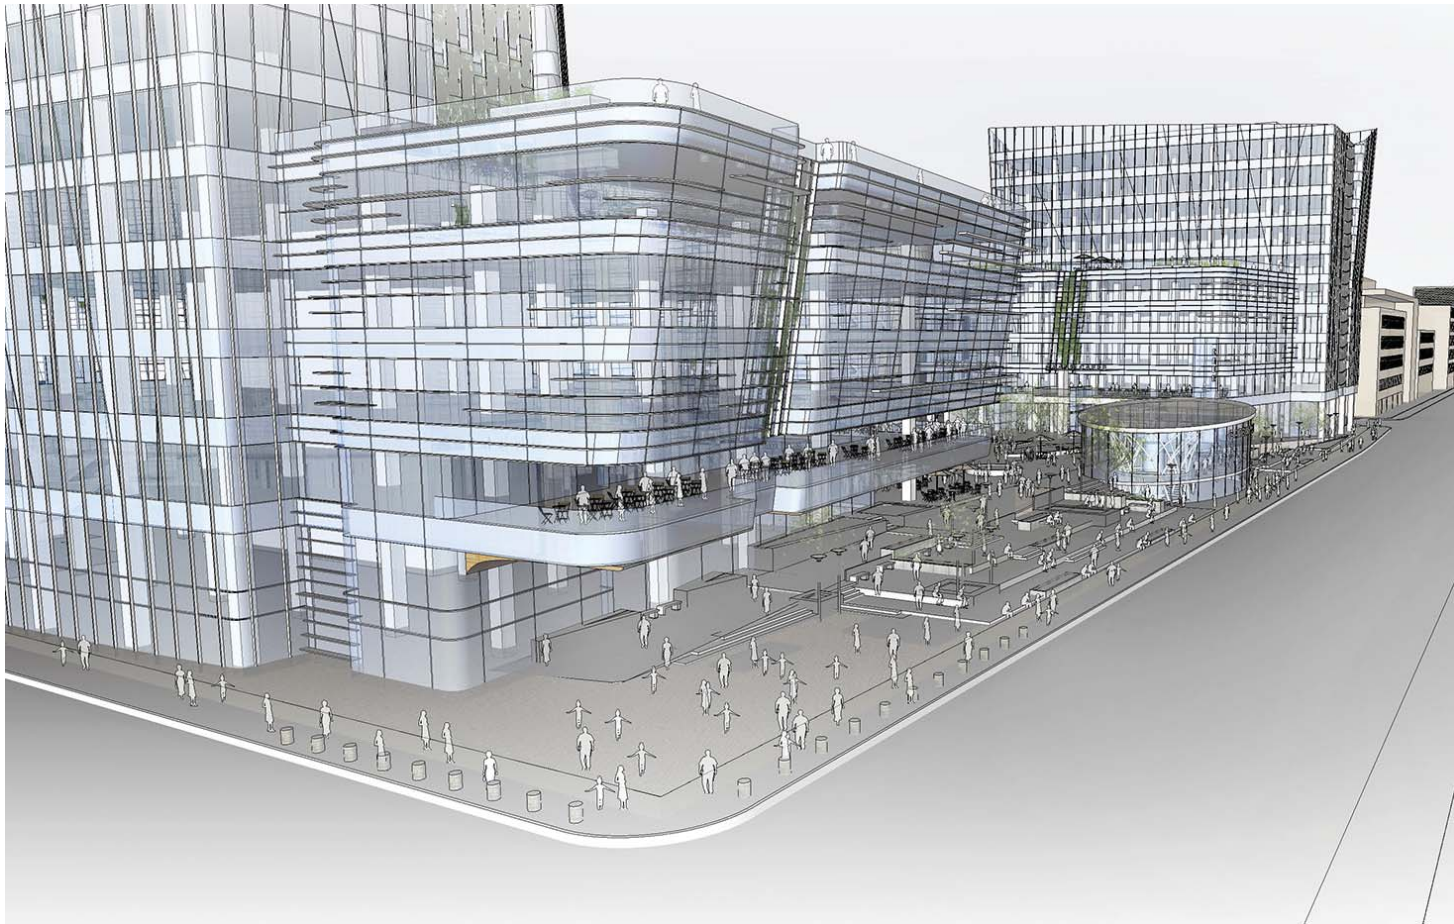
Concept Sketch from Northeast Corner - South Street Office, Northwest Plaza, and Gate House
